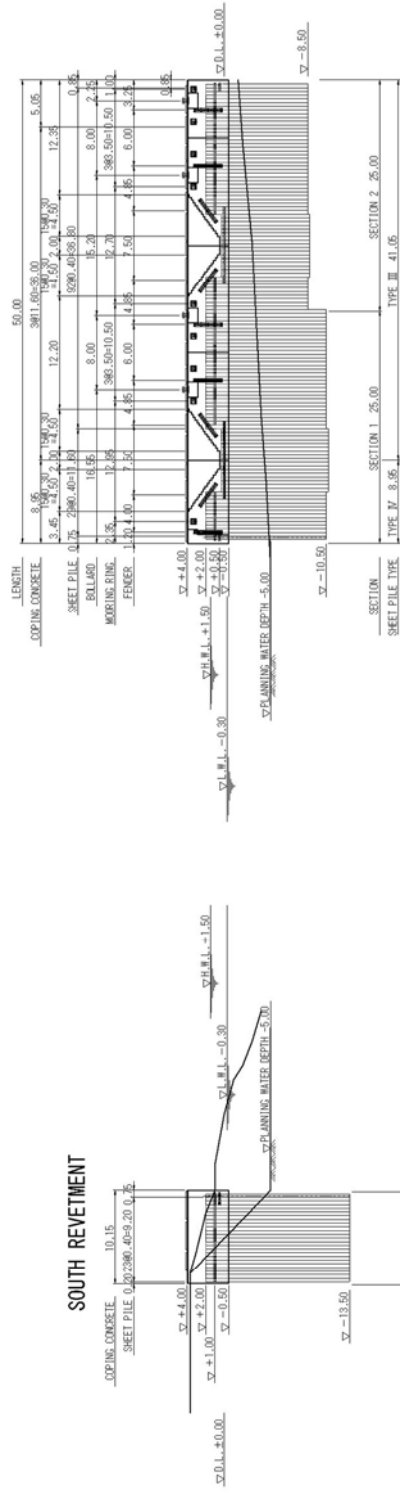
Plan of Sheet Pile Arrangement
